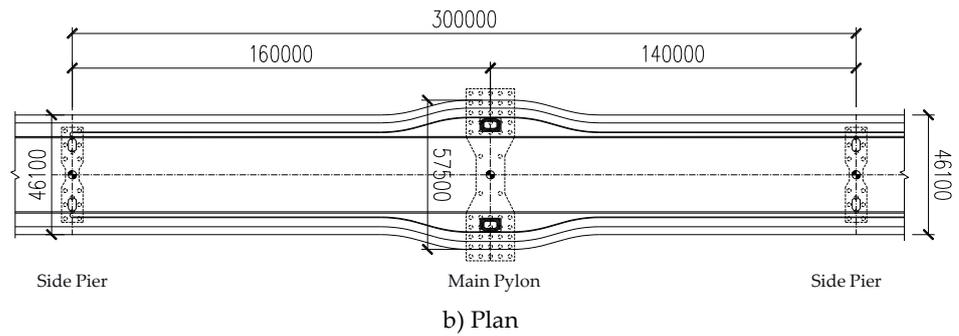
General layout of the Zhongxing Bridge (unit: mm)
